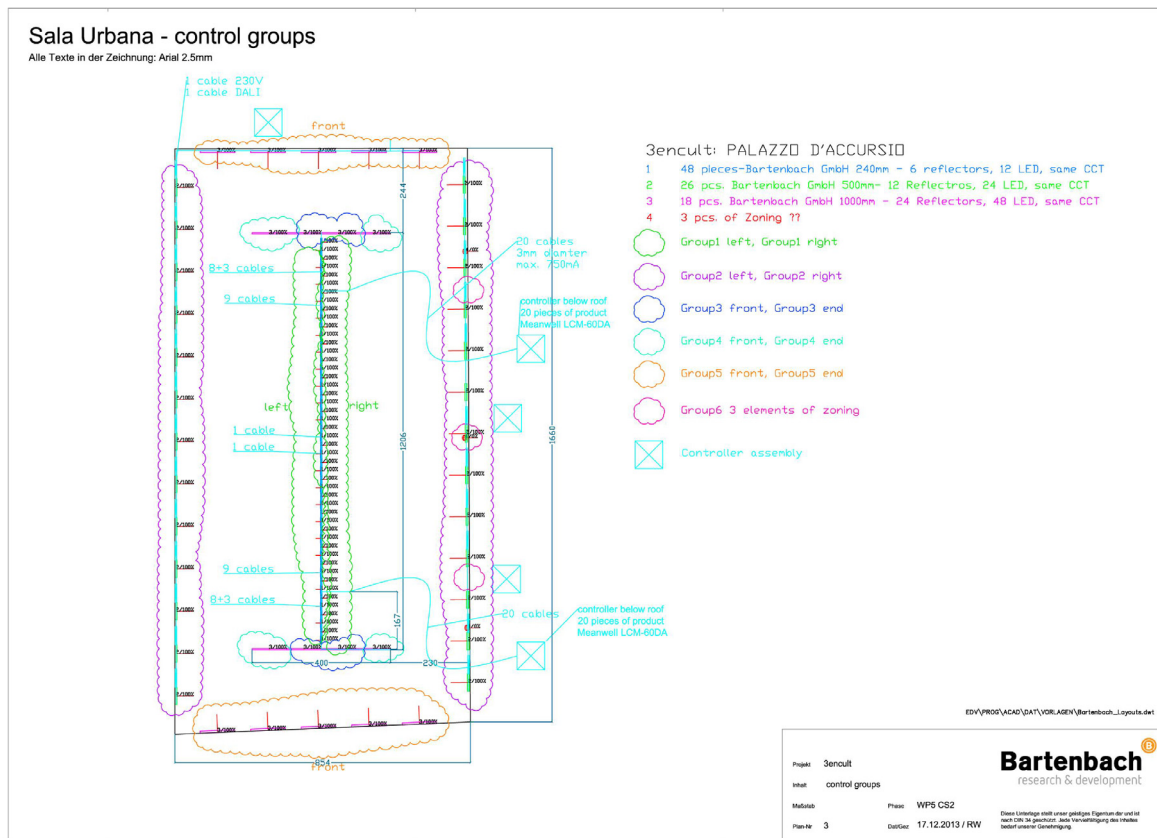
Control groups disposition and details of the lighting supporting structure
